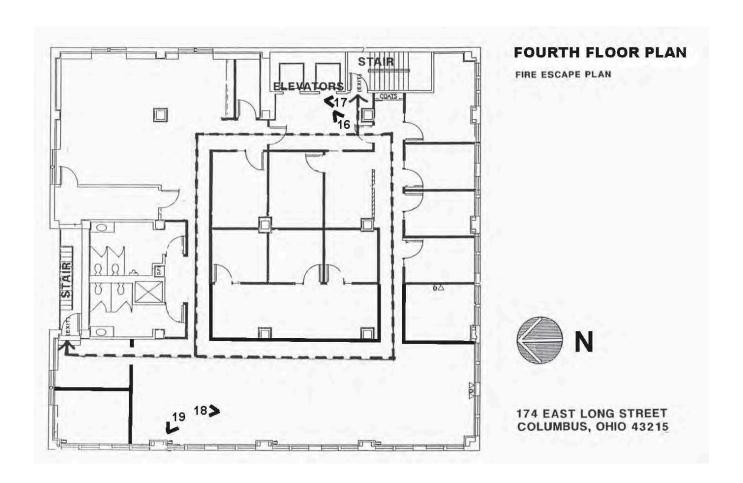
The Standard Building Floor Plan/Photo Key – Fourth Floor (Third Floor Similar)
